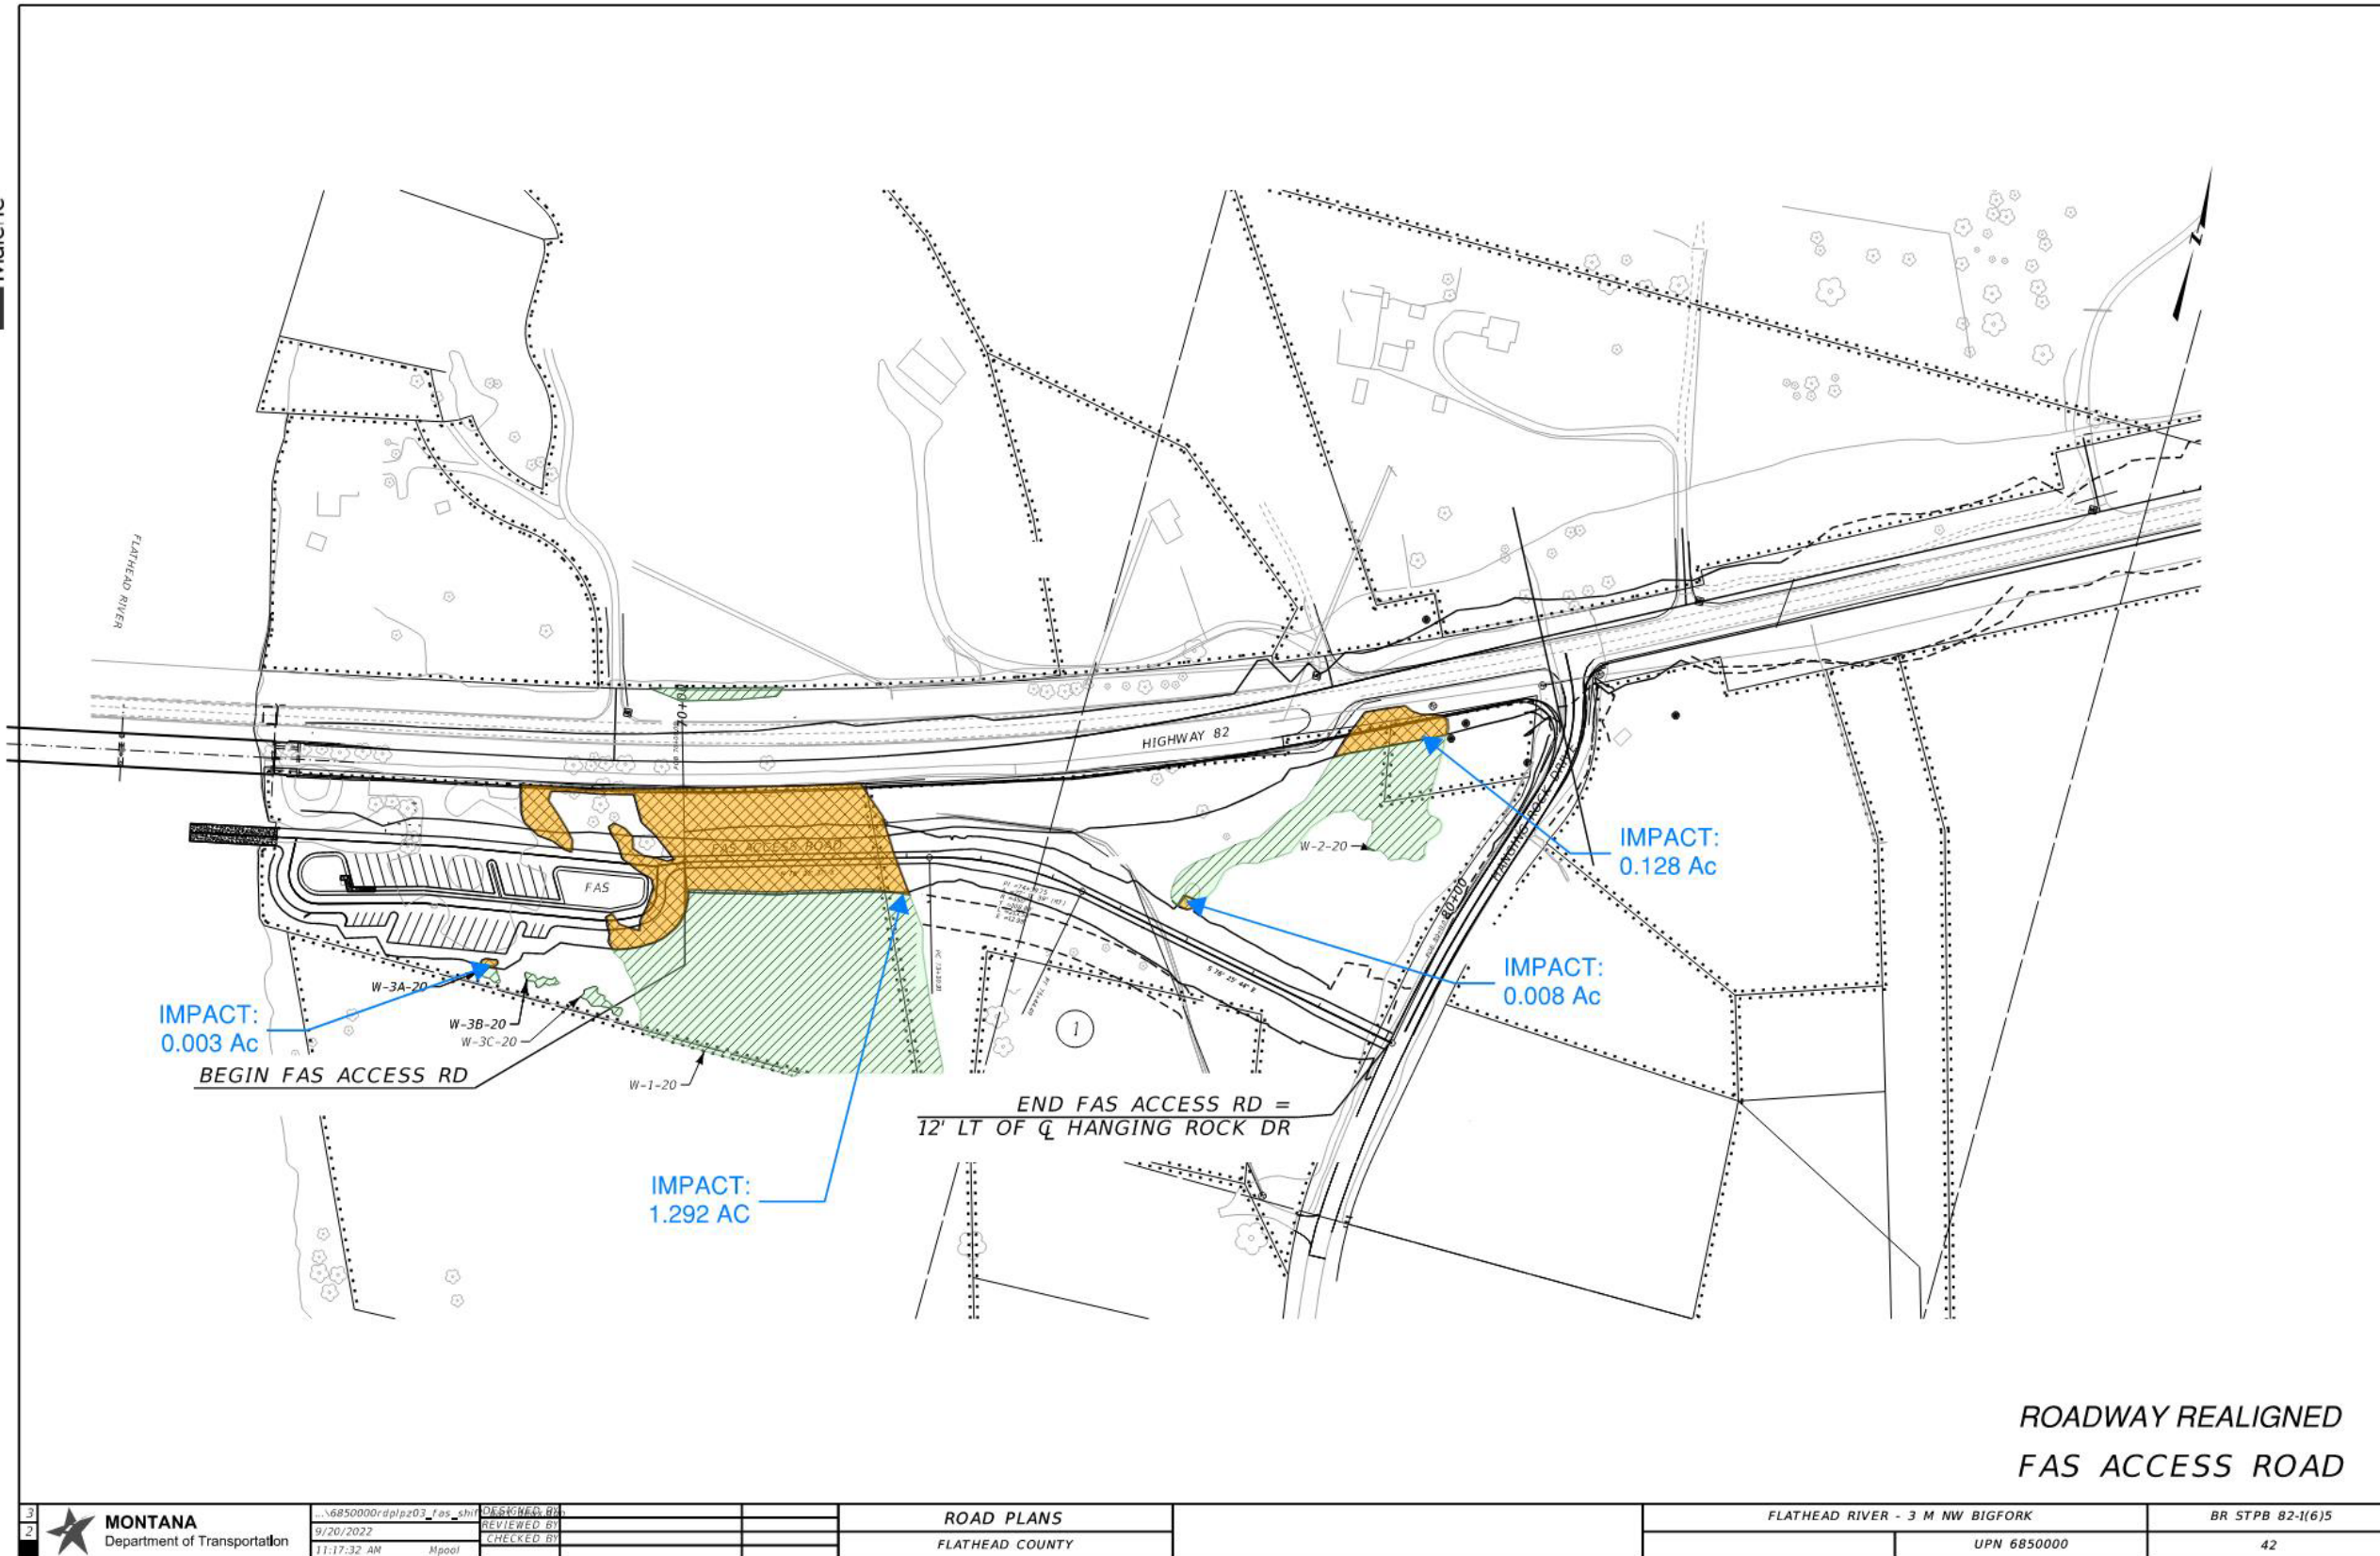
FAS Design Option 2 – Southern FAS Access Road Alignment
